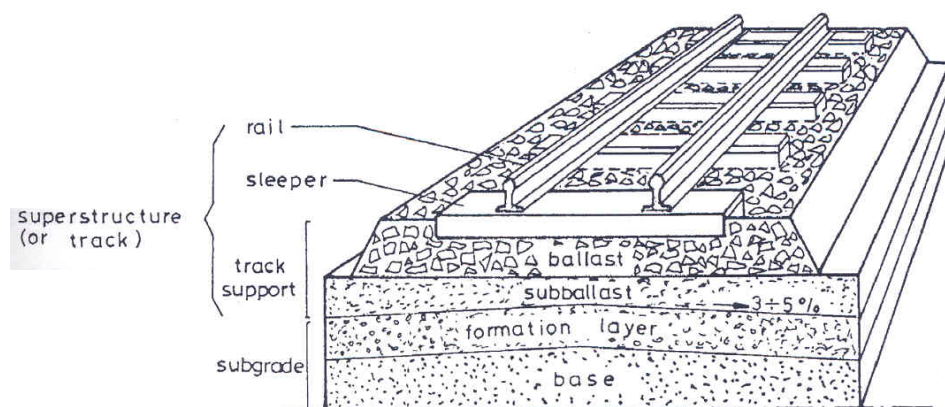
A Typical Track Structure (Profilidis (2000))
